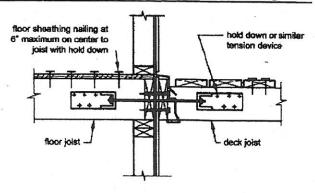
Attachment of Free-Standing Deck to House for Deck Stability
